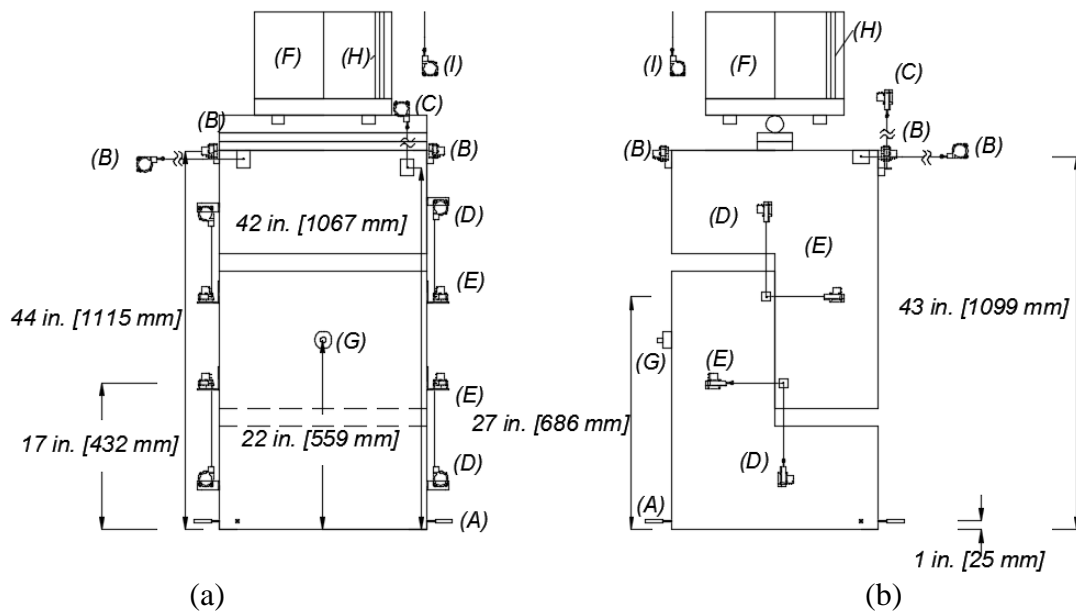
External instrumentation elevation view for specimens containing #4 [#13M] reinforcing bars across the interface: (a) Front view elevation, (b) side view elevation
